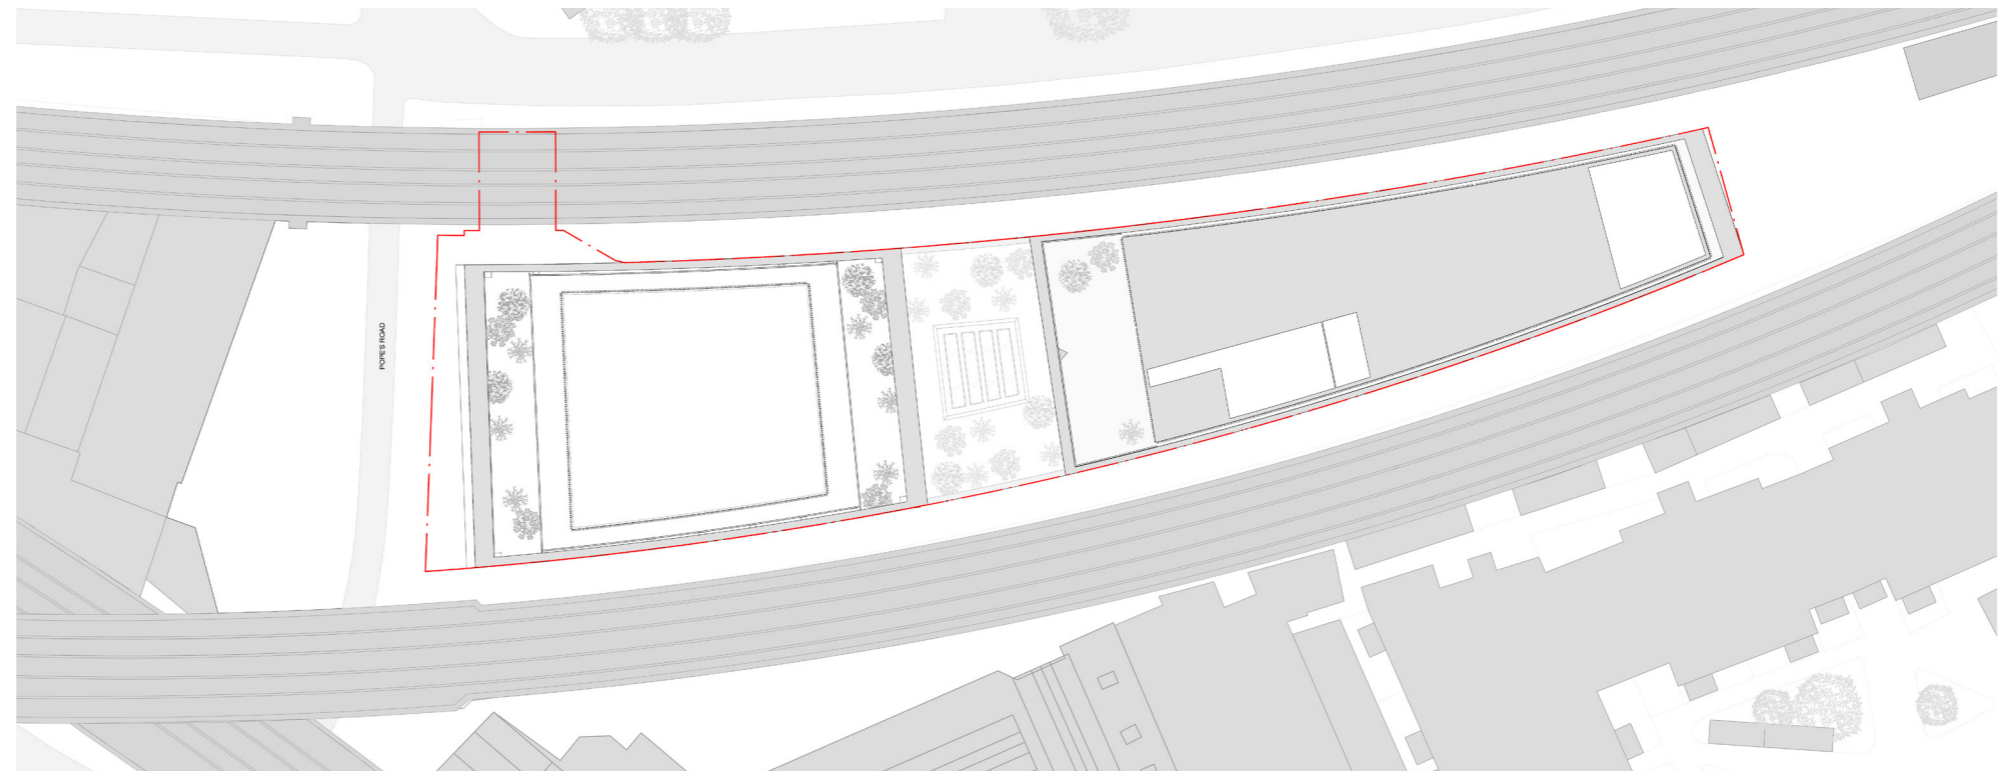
July 2020 Planning Addendum site plan
